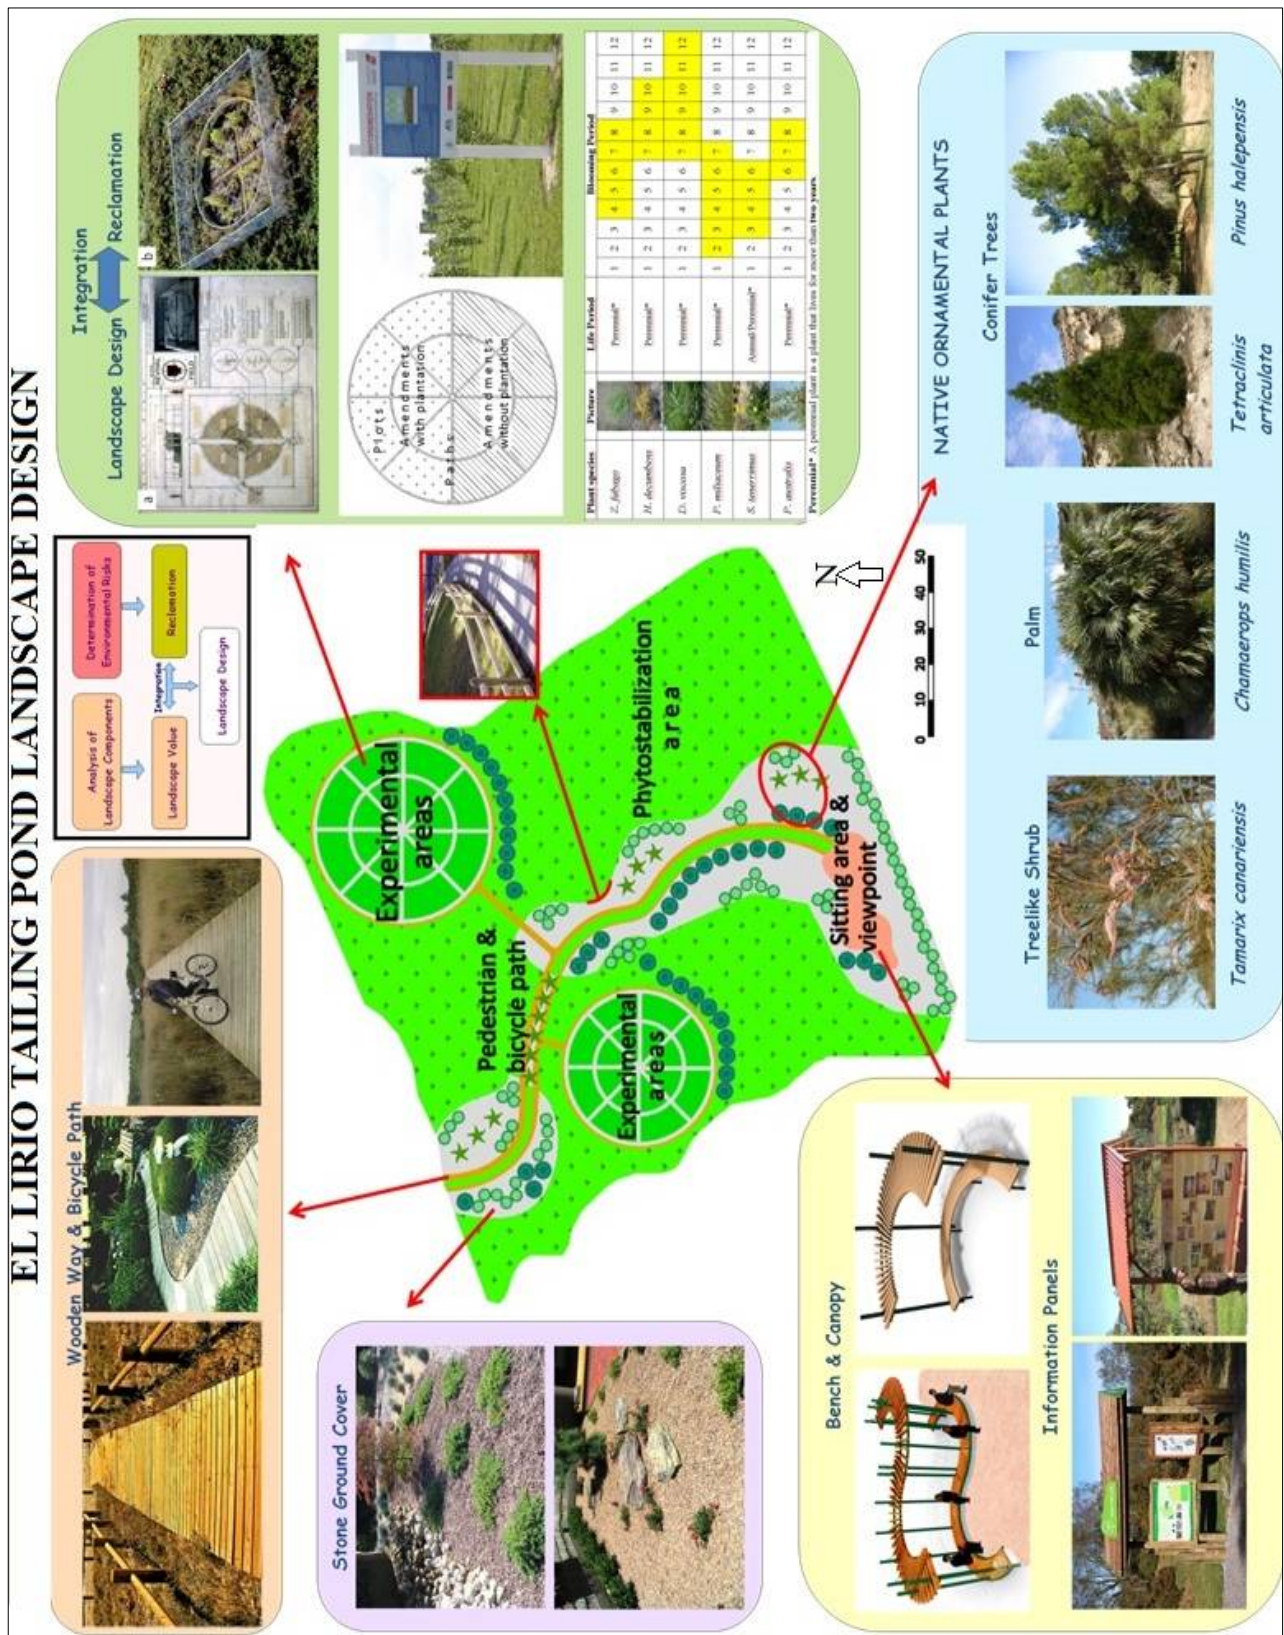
Proposed design of El Lirio mine tailing (Autocad 2008).
